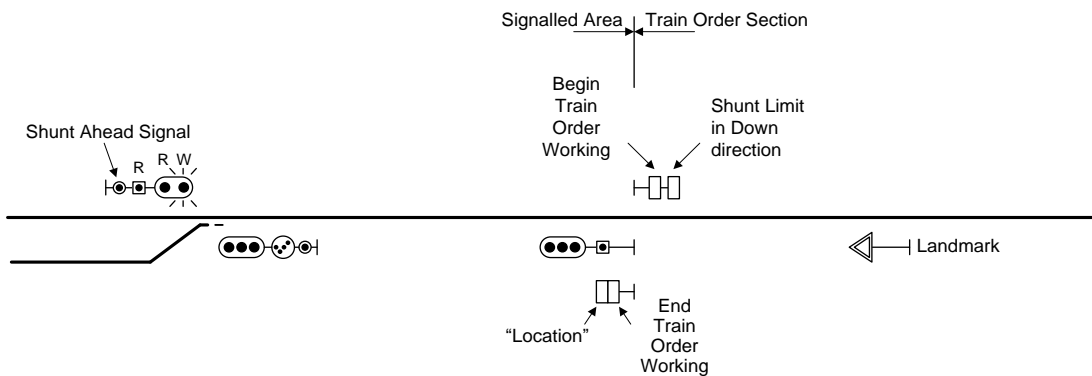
B: TRAIN ORDER SECTION ADJACENT TO SIGNALLED AREA ALTERNATIVE ARRANGEMENT WHERE SHUNT LIMIT BOARD PROVIDED
